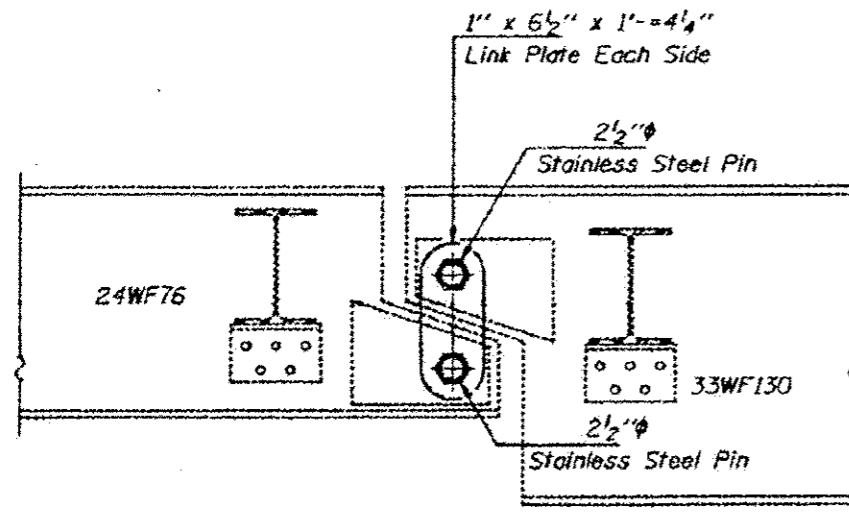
DETAIL OF BEARING AT PIER 2 OR W. ABUT.
